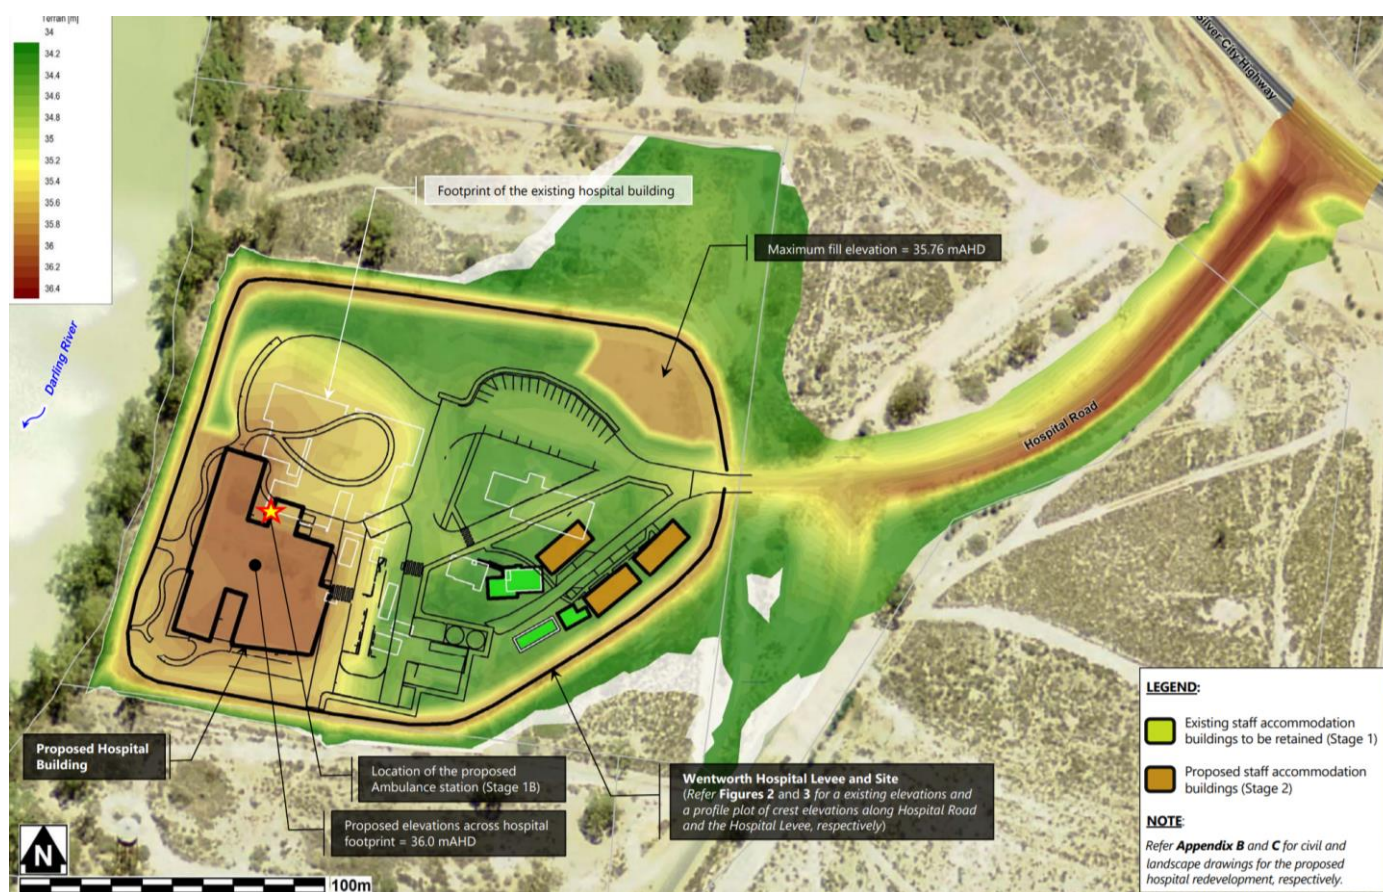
Proposed surface elevations at the hospital (Advisian)
